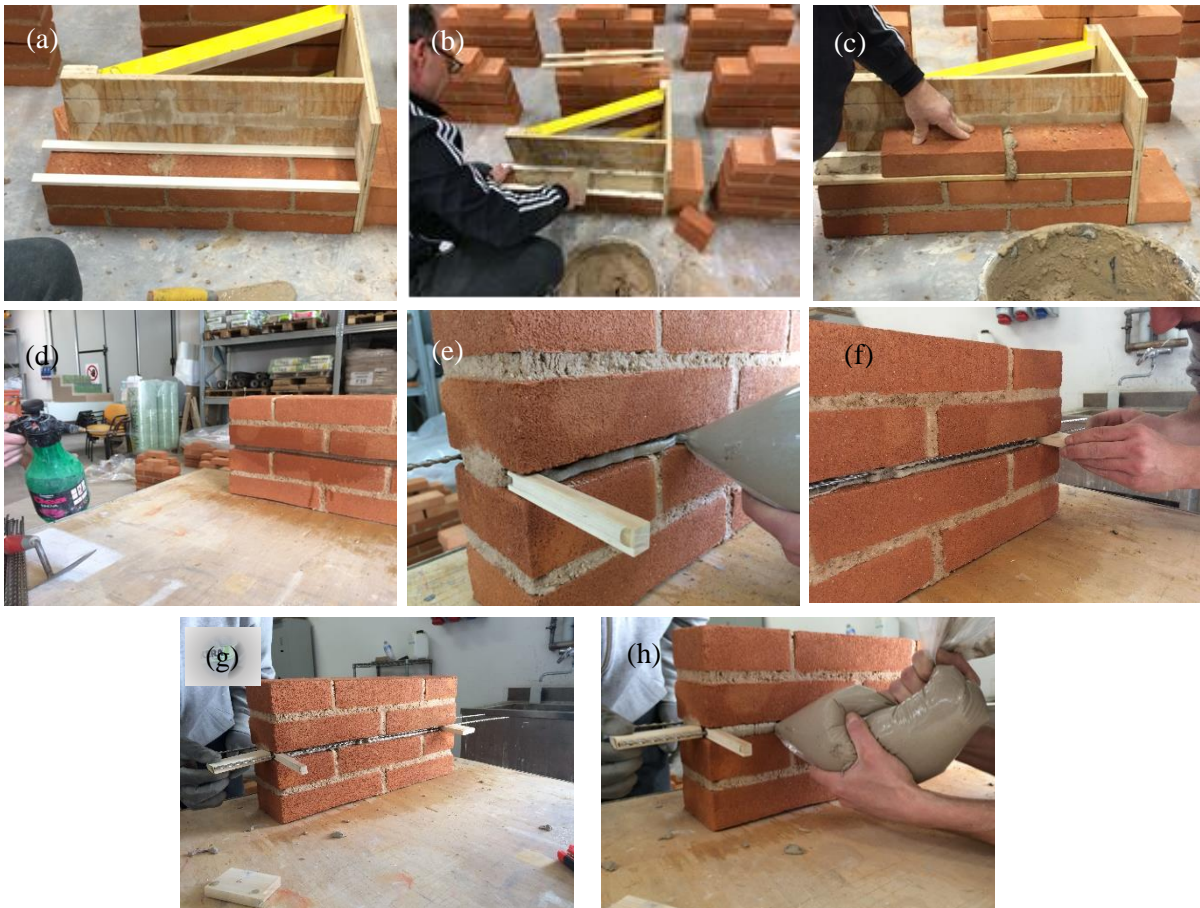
Construction phases of the masonry wallette with $L_B = 450$ mm: a) in the second layer two wooden slats placed symmetrically were used to create a groove, b) casting of the central mortar joint, c) bricks were placed on top of the central joint, d) after 7 days of curing, wooden slats were removed and the grooves were wet, e) the grooves were partially filled with a first layer of mortar_s, f) bar was pushed in the fresh mortar in order it was completely surrounded by mortar_s, g) insertion of wooden elements for correct bar positioning and f) a final layer of mortar_s was used to seal the grooves.
